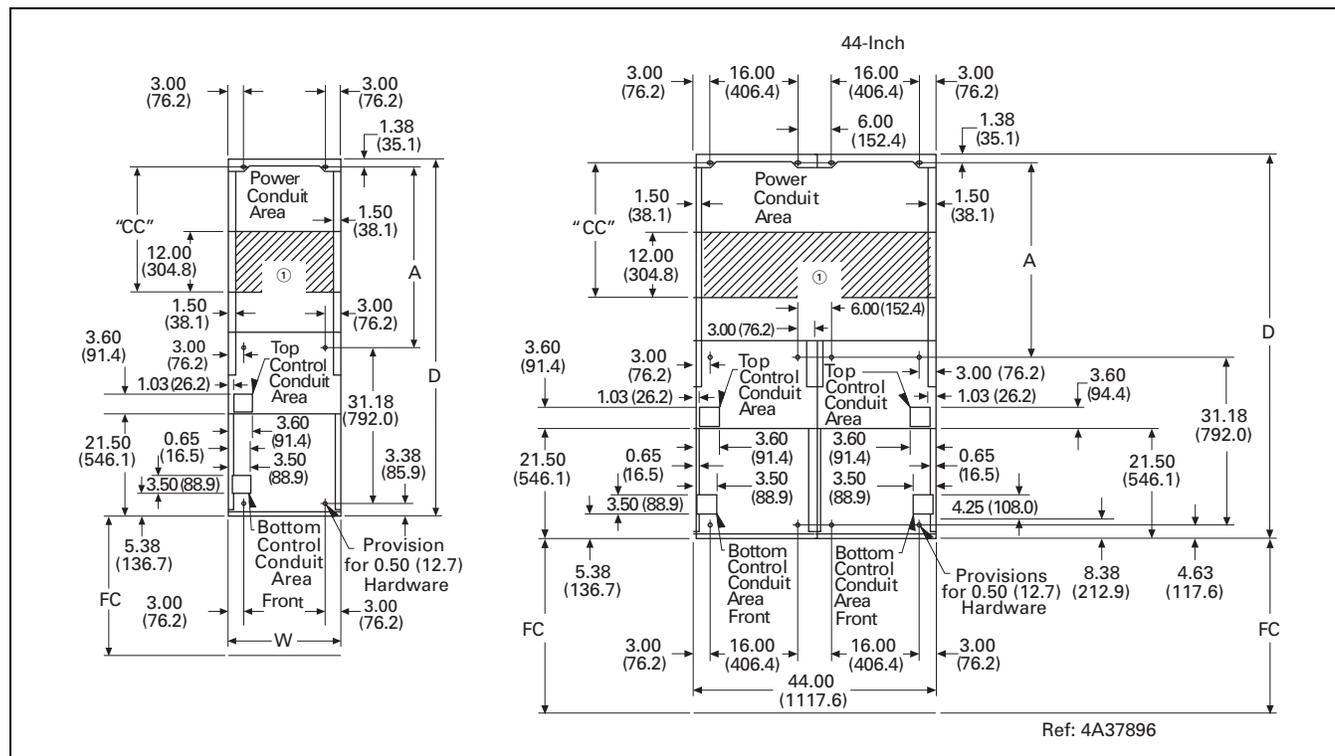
Floor Plans and Available Conduit Space in Inches (mm)—18.00, 22.00, 30.00, 44.00-Inch (457.2, 558.8, 762.0, 1117.6 mm) Wide Rear-Access Structures
